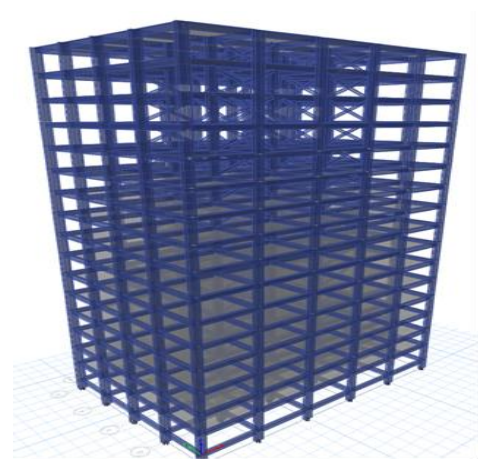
3D view of G+15 RC frame building with inner X type steel bracing
